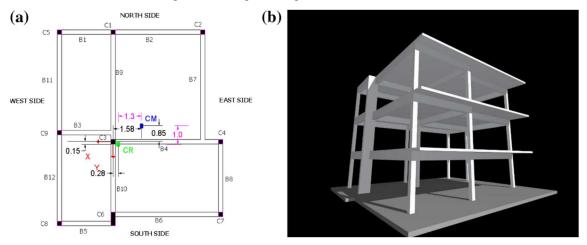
Plan configuration (left) and rendering (right) of the SPEAR structure
